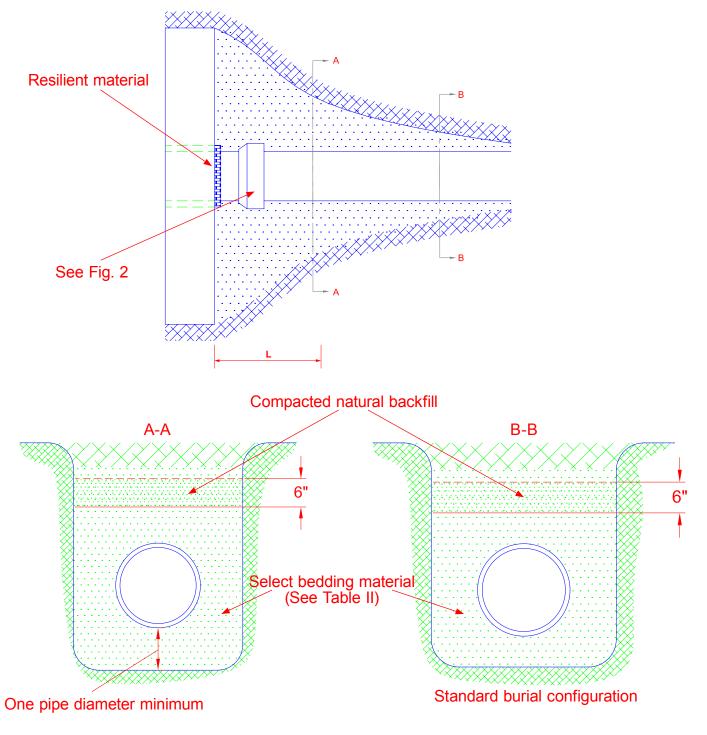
Pipe Going Through (or Under) Concrete Structure
